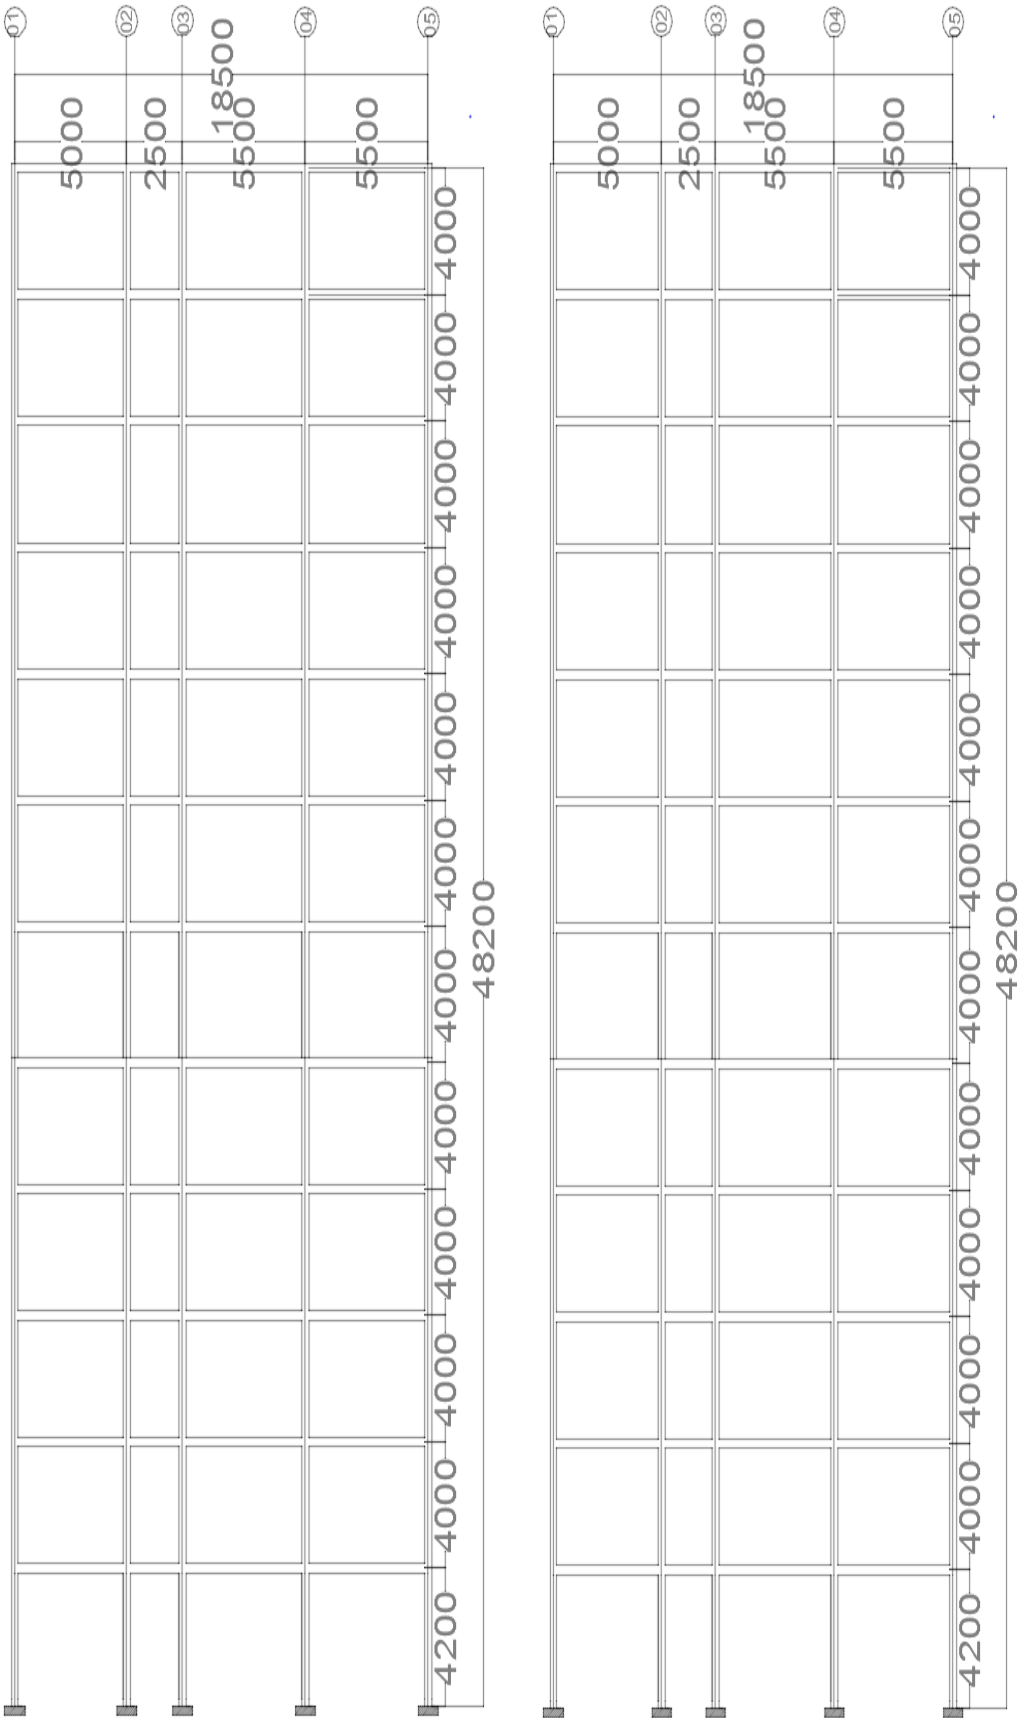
Section A-A of 12 Story Building Figure 3.6 Section 1-1 of 12 Story Building
